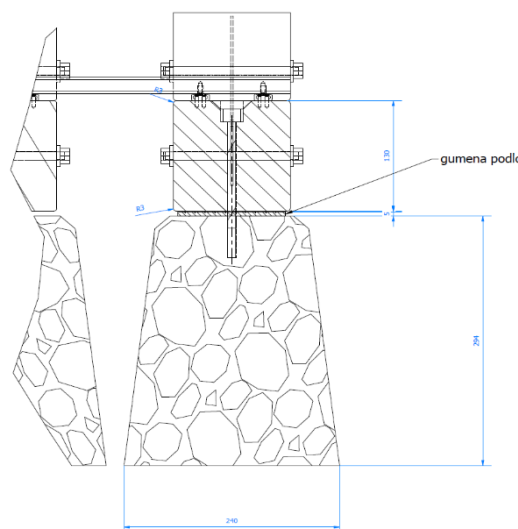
Elevated construction on concrete feet imitates installation on the so-called “babak” in traditional construction.
